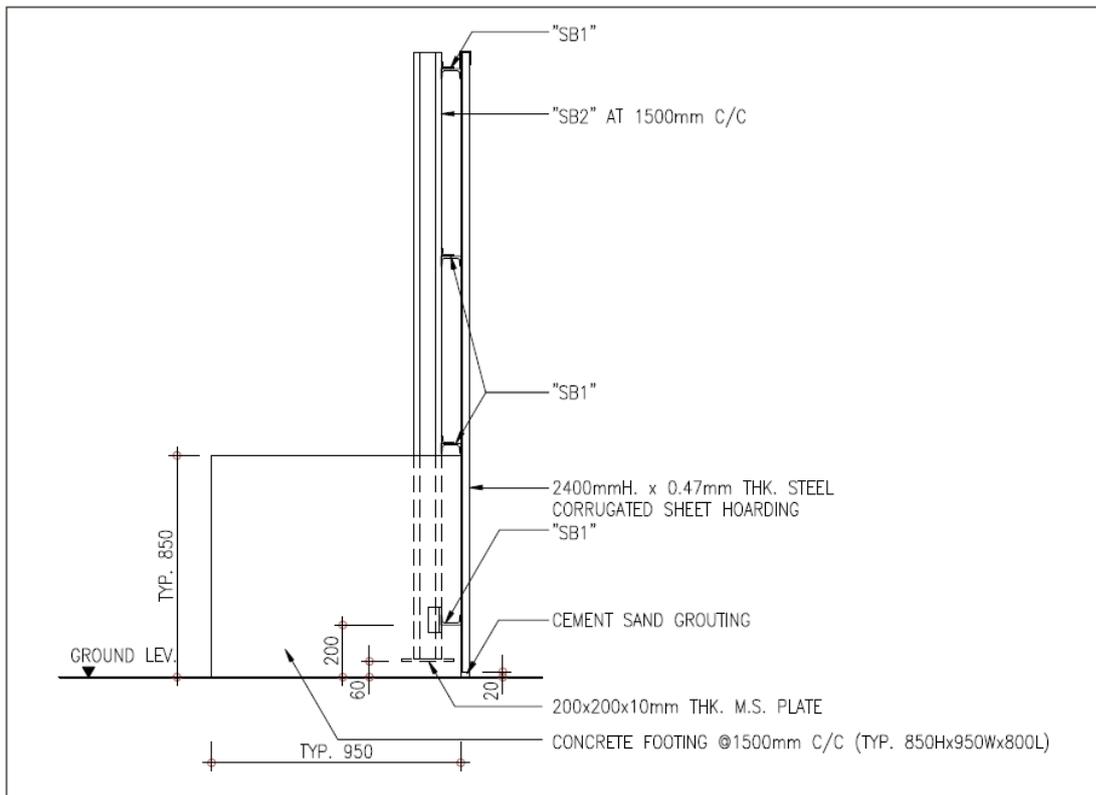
Proposed Design of Footing and Closed Boarding for Temporary Hoarding (Side View)
